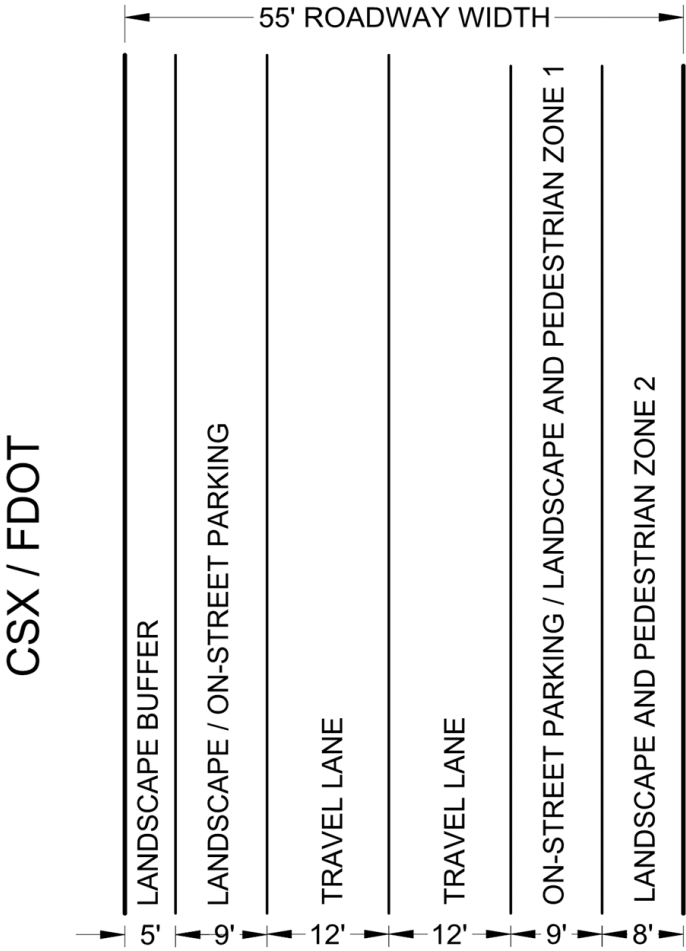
b SW 30th Avenue Road Profile Not Abutting Interstate-95
